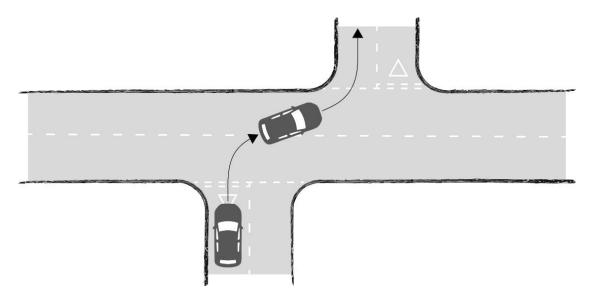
Example of a staggered junction alignment (Credit – Create Streets)
